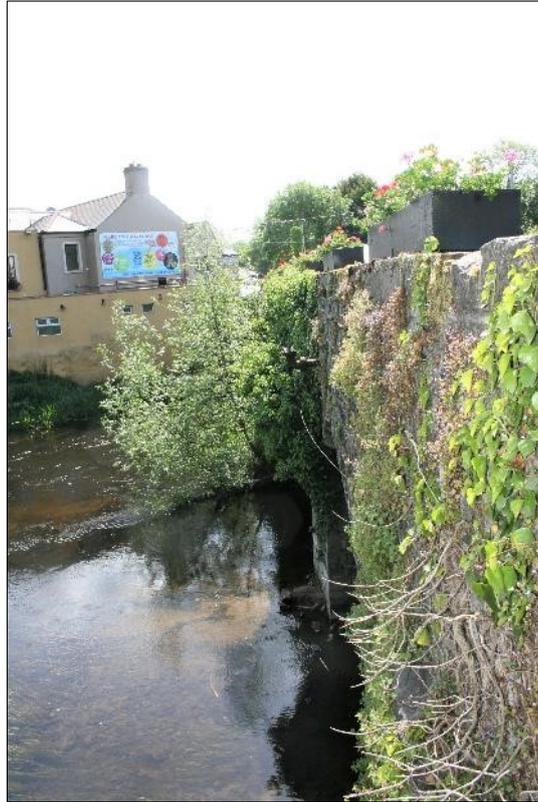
Tree rooted into pier and extensive heavy ivy growth on north-east elevation looking south-east
